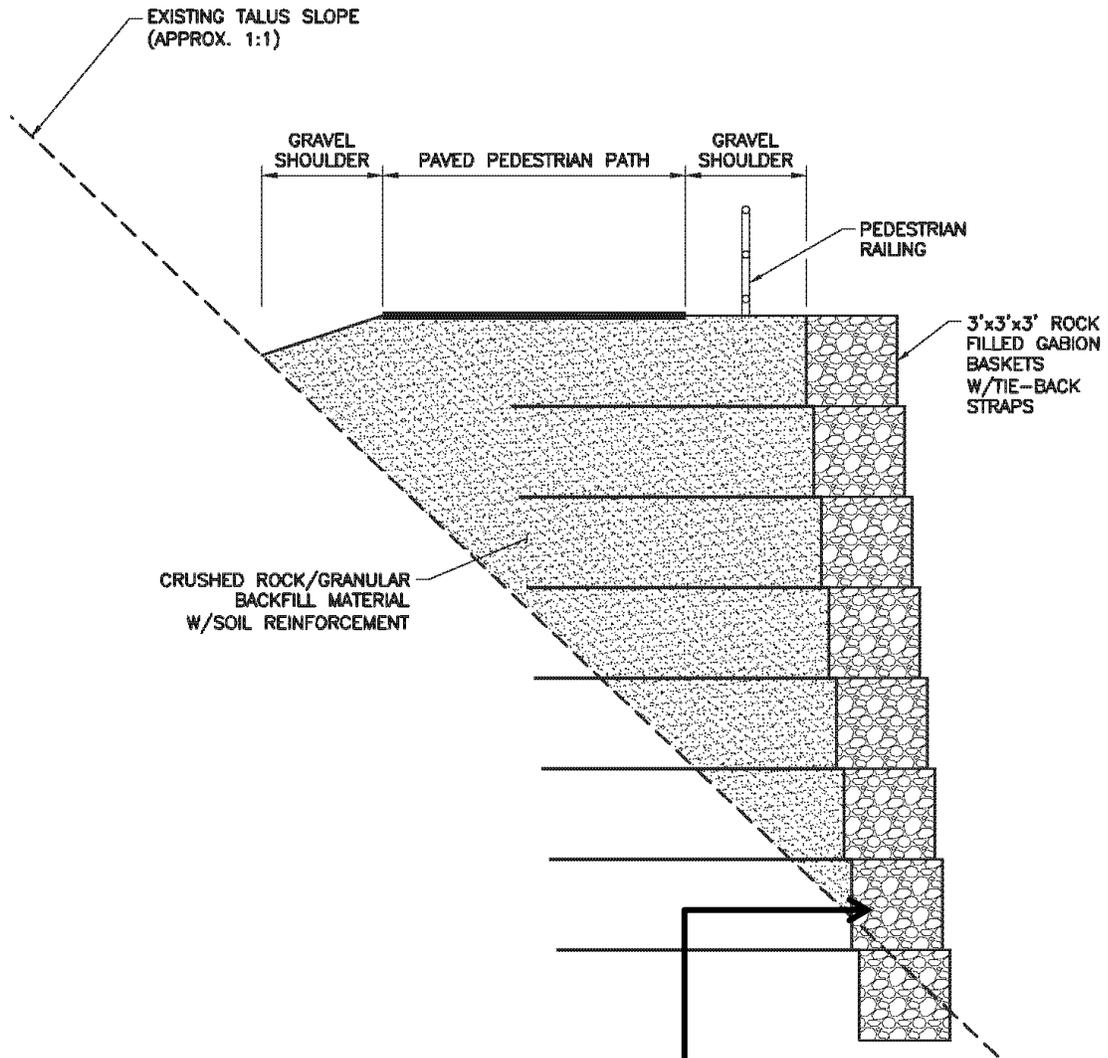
EXAMPLE GABION RETAINING WALL
